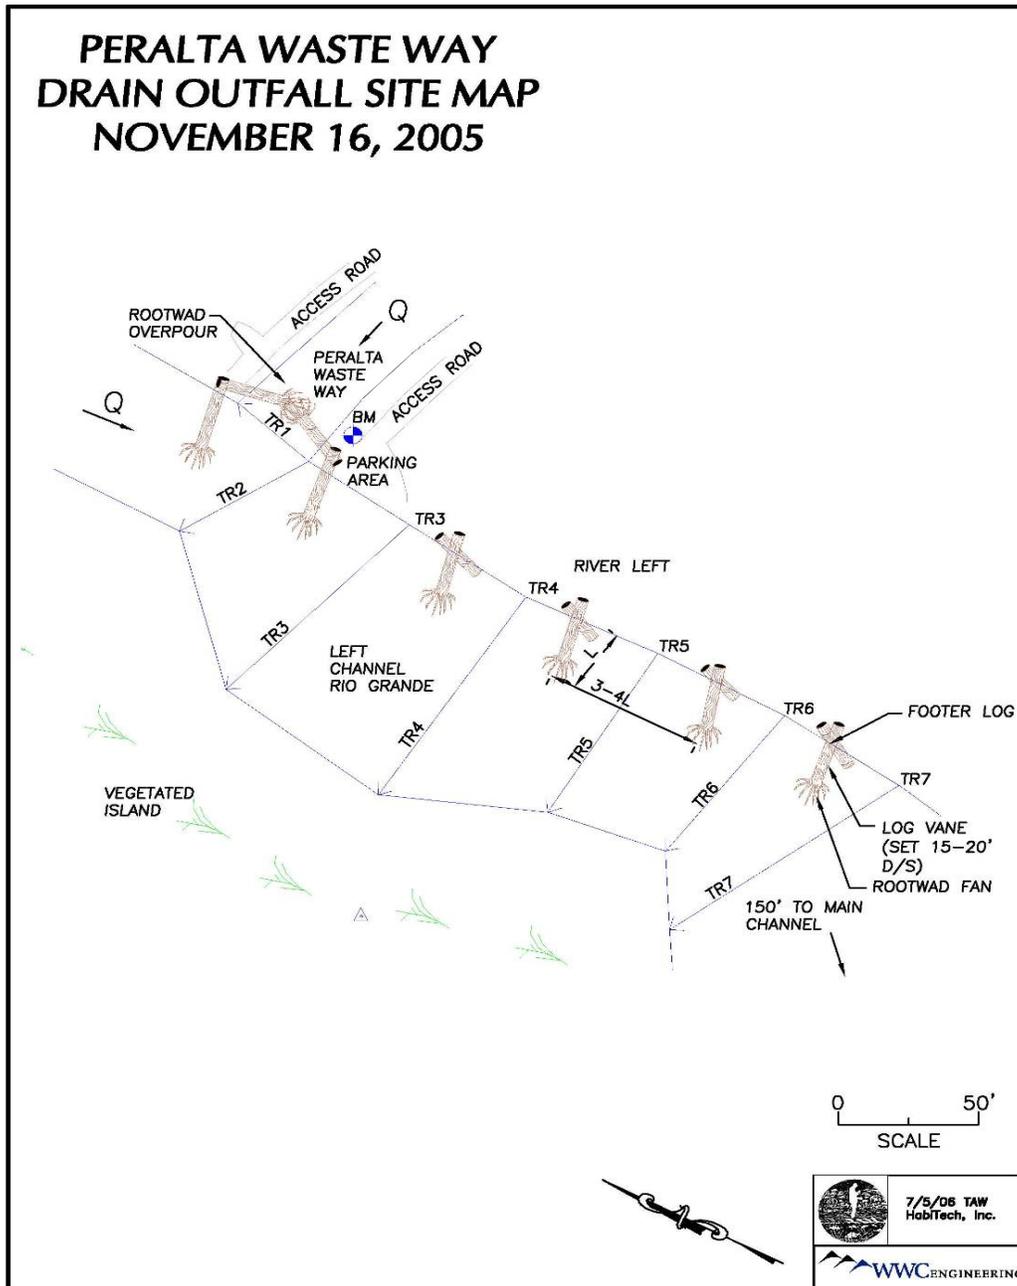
Site Plan for the Peralta Wasteway Drain Outfall.
